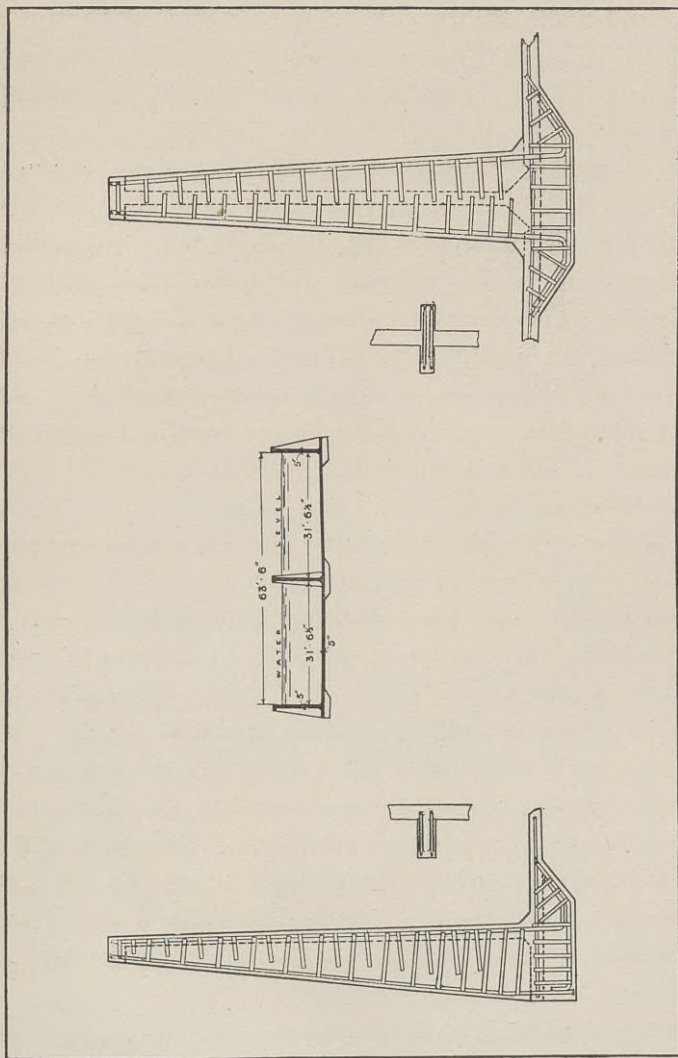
Section of Sewage Tanks at Great Malvern and Details of Reinforced Concrete Walls.
